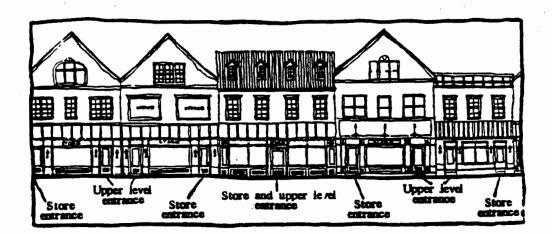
Ground floor commercial uses should be differentiated by the facade treatment.
